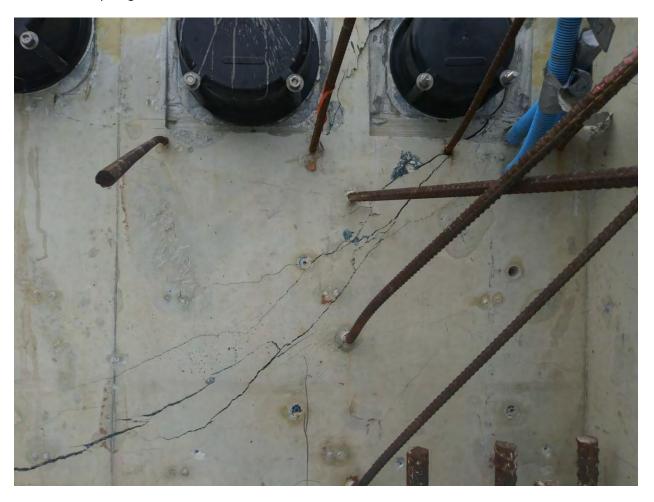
Diaphragm 2, Eastside Top view cracks
